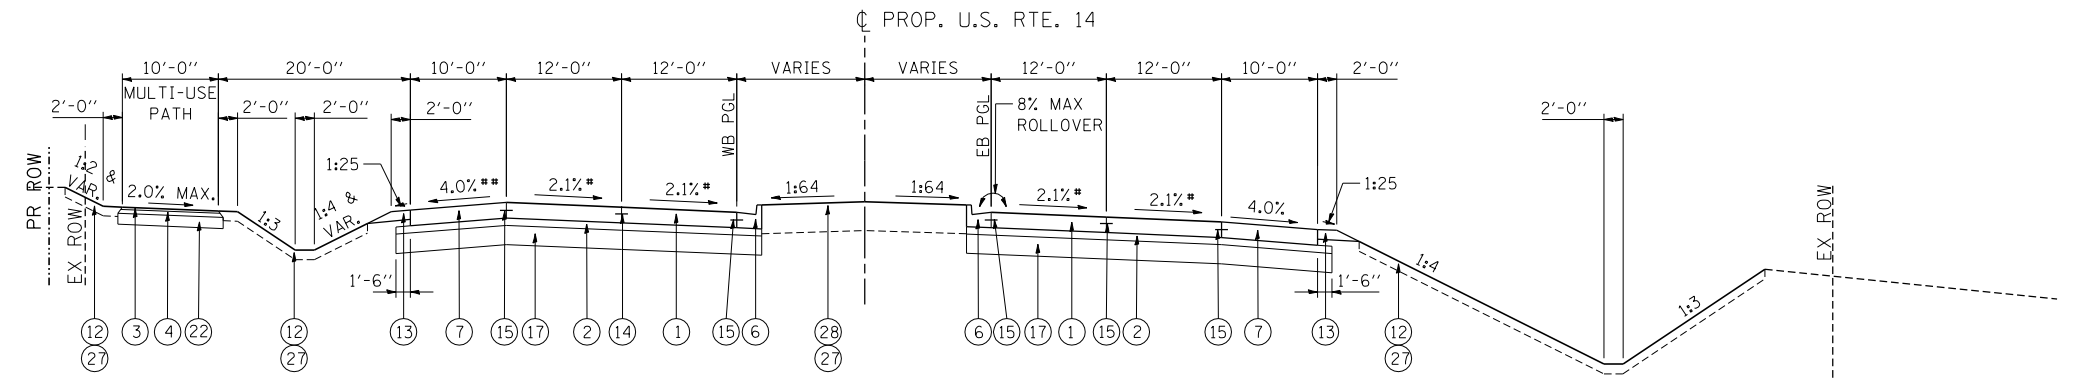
FROM STA. 325+74.26 TO STA. 326+64.78
